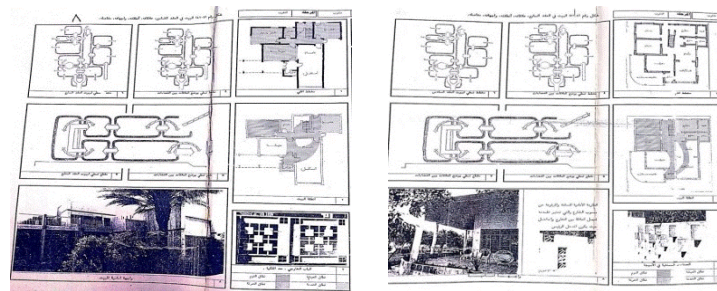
examples of Baghdadi house plan in 1960s and 1970s
